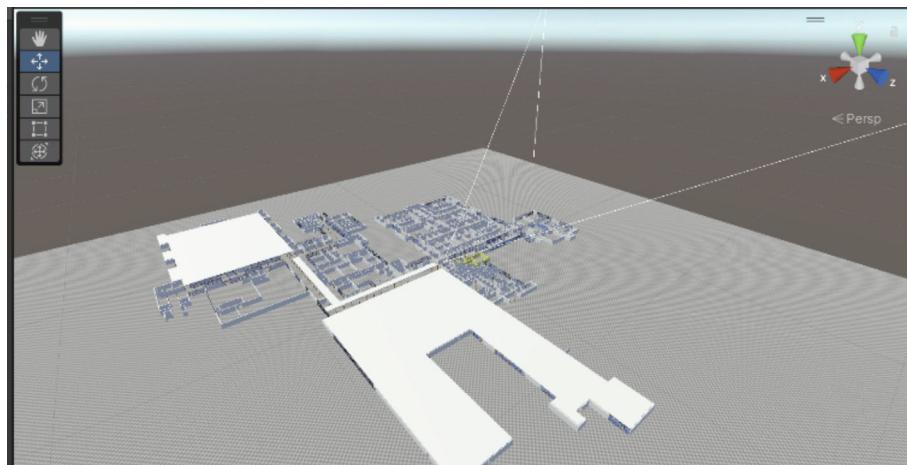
Initial modeling: 2D model of the campus building exported to sketch up and extruded to create a 3D model (2nd floor plan).
